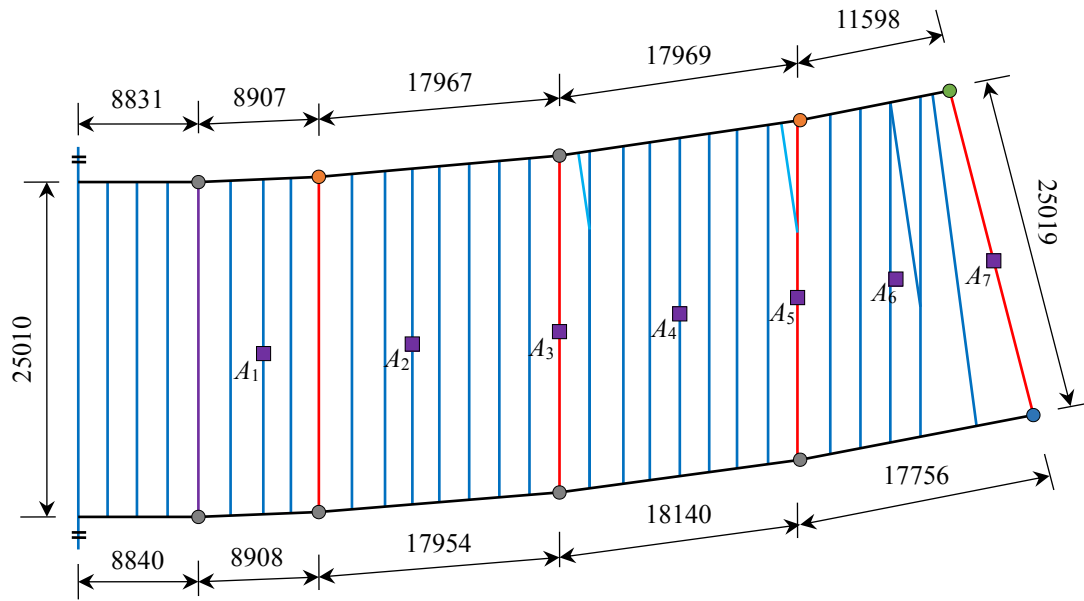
Outline of prestressed concrete floor #4 (all dimensions in mm)
